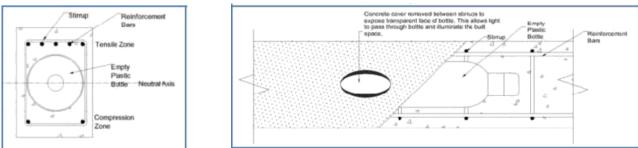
Transverse section of a typical beam made with plastic bottles Figure2: Longitudinal section of a typical beam made with plastic bottles.
